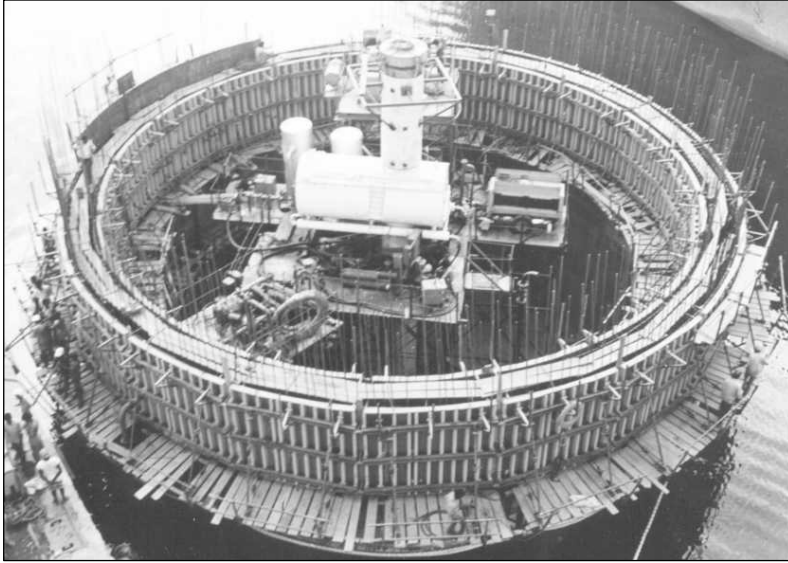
Caisson for Intake Structure Being Floated into Deep Sea, Visakhapatnam.
